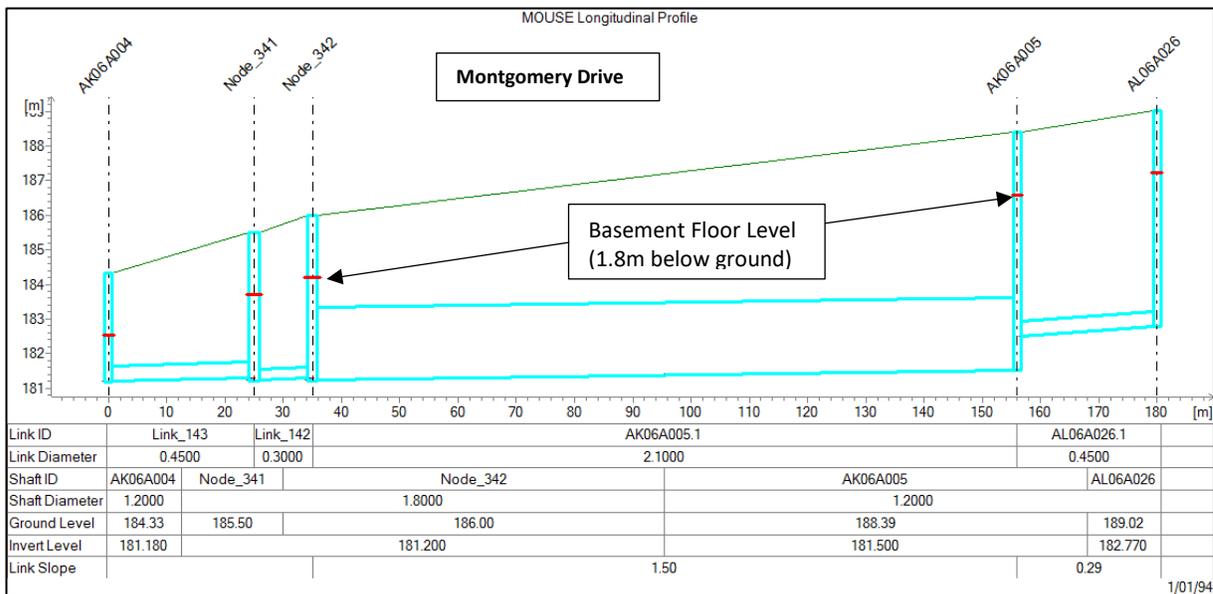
Profile of the Inline Storage Facility on Montgomery Drive
